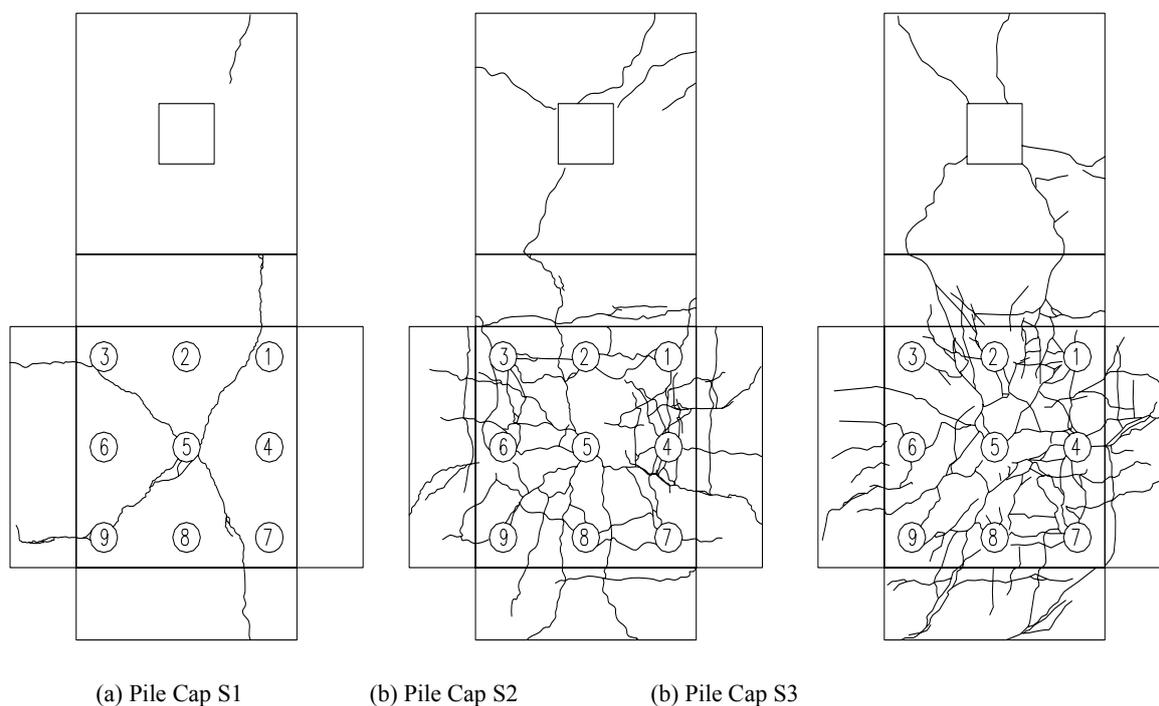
Typical crack patterns of the pile cap specimens
